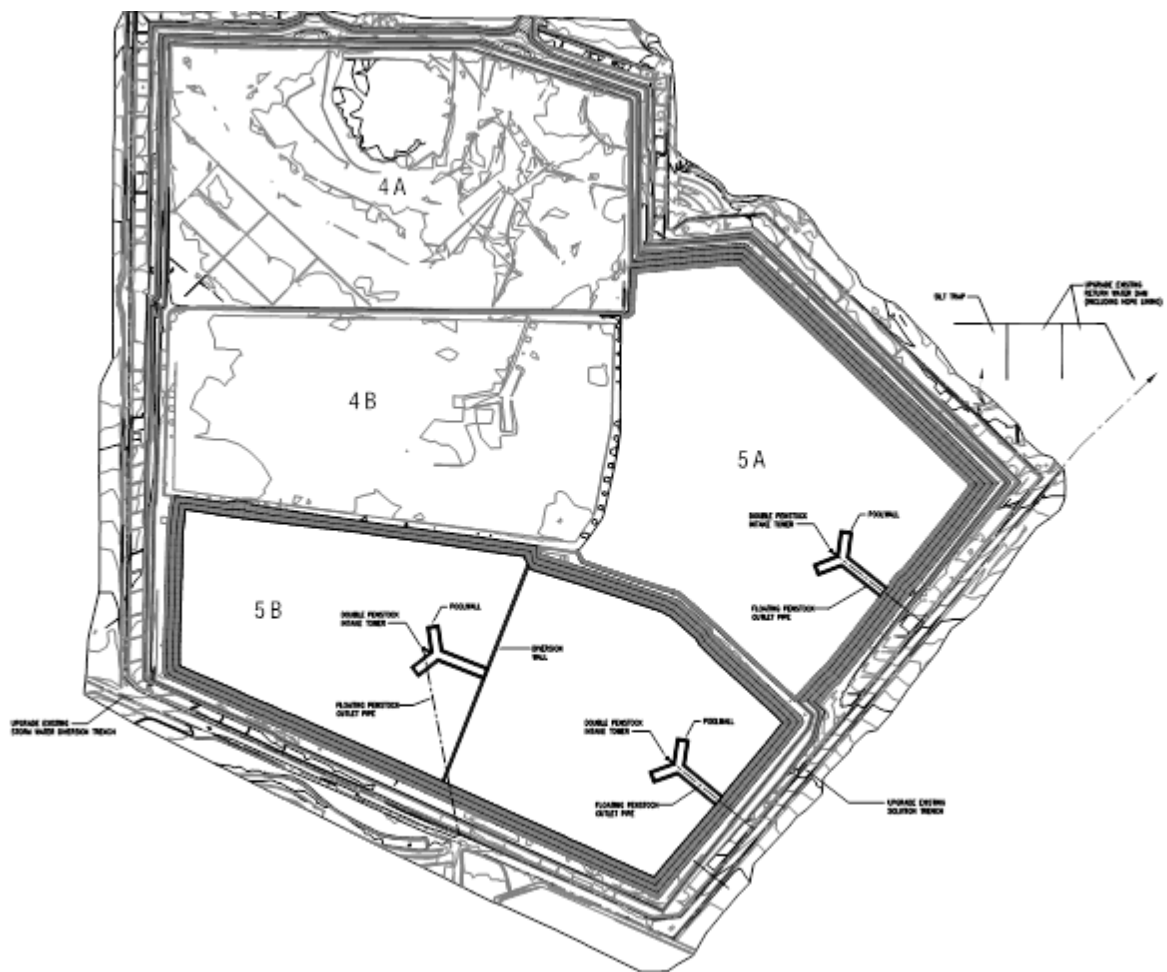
GENERAL LAYOUT OF THE TAILINGS STORAGE FACILITY
